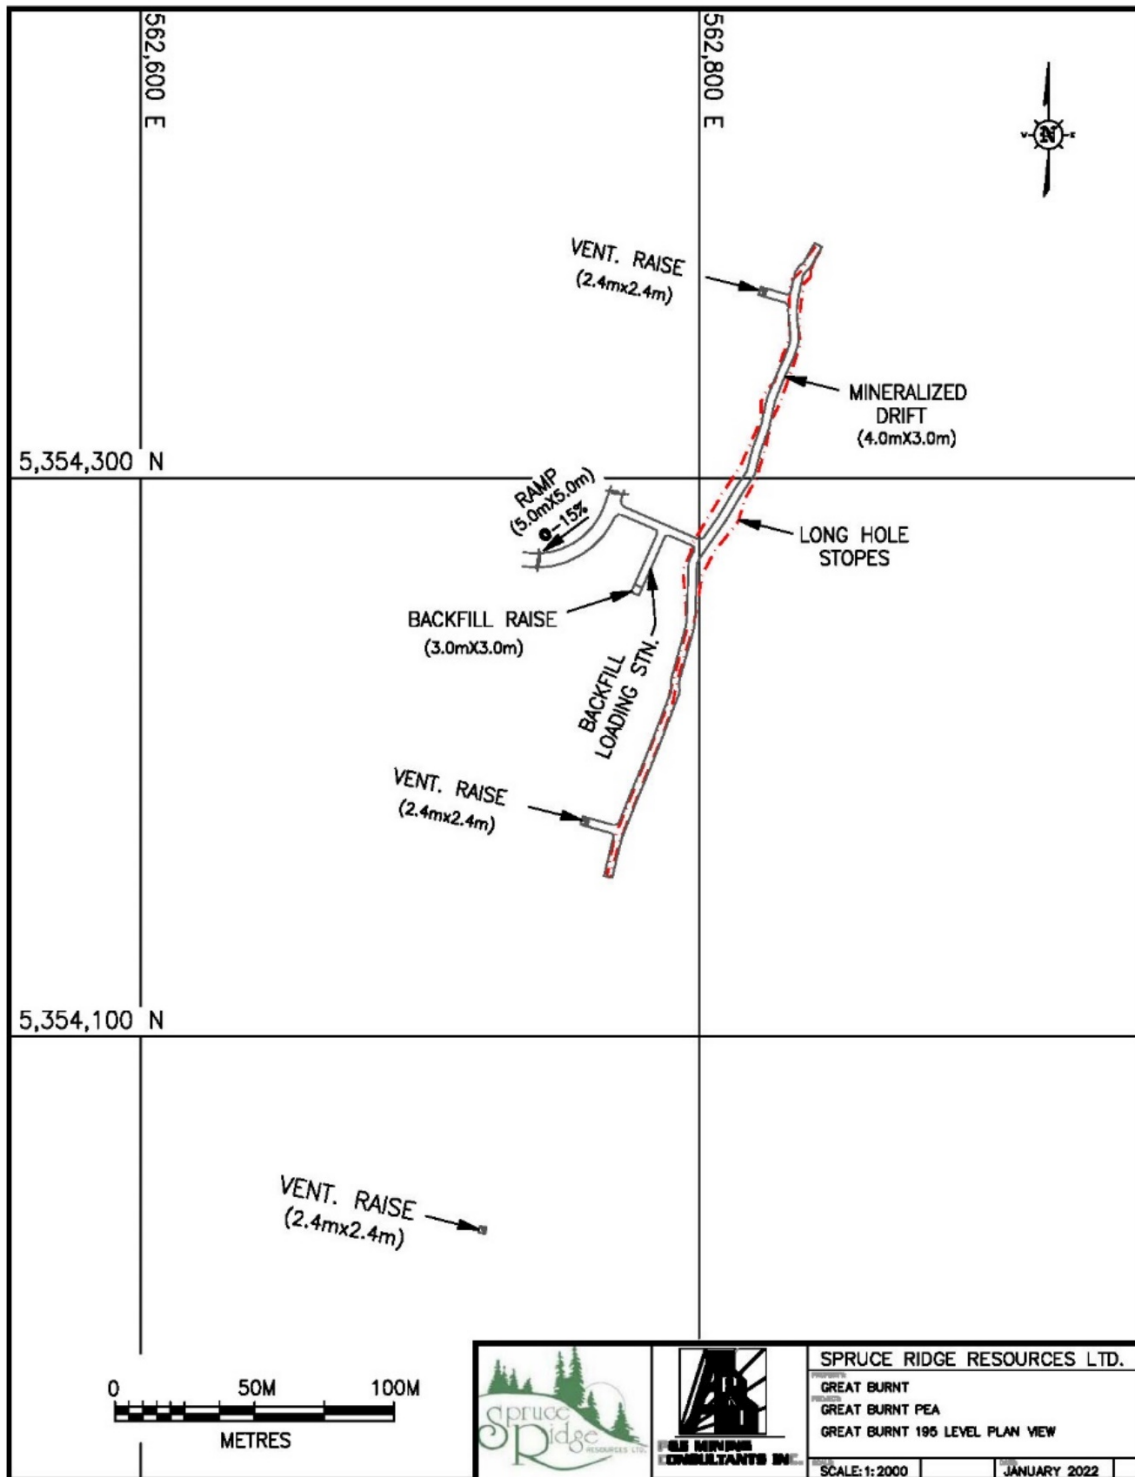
GREAT BURNT 60 M ELEVATION LEVEL PLAN
